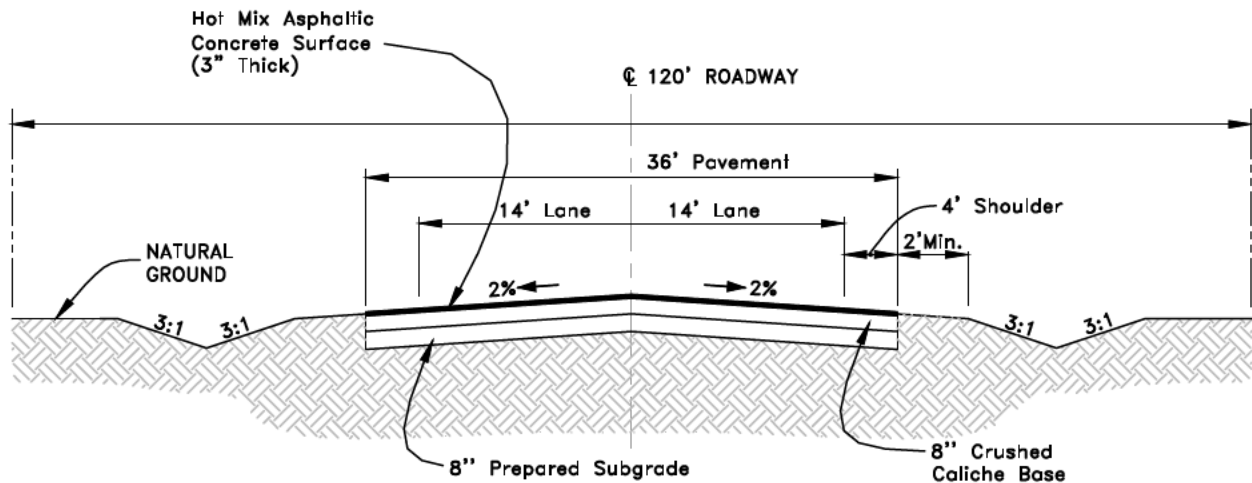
Typical section for Hot Mix Asphaltic Concrete Surface.
